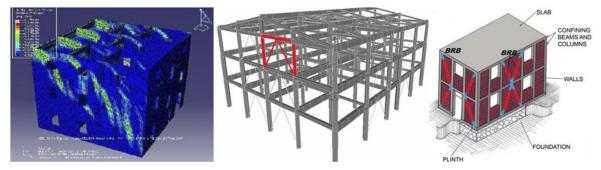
Rehabilitation of masonry walls: with steel mesh and shotcrete, steel braces, MRF steel frame.
